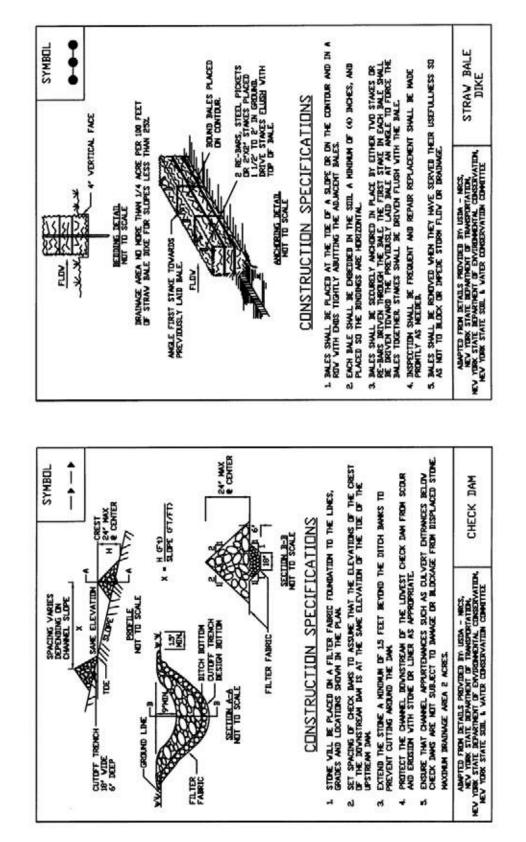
Construction Details for Straw Bale Dike and Check Dam
